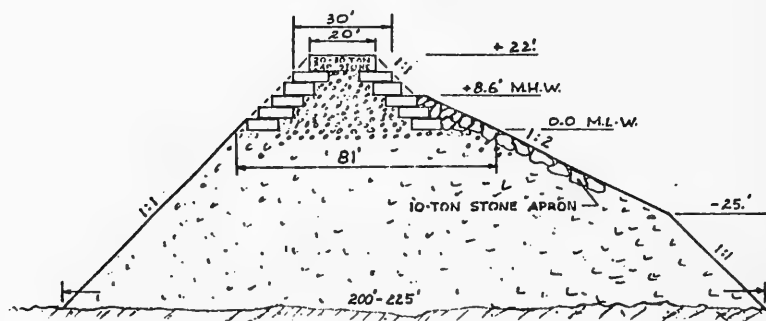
Typical proposed cross section (U.S. Army Engineer Division, New England, 1972).
